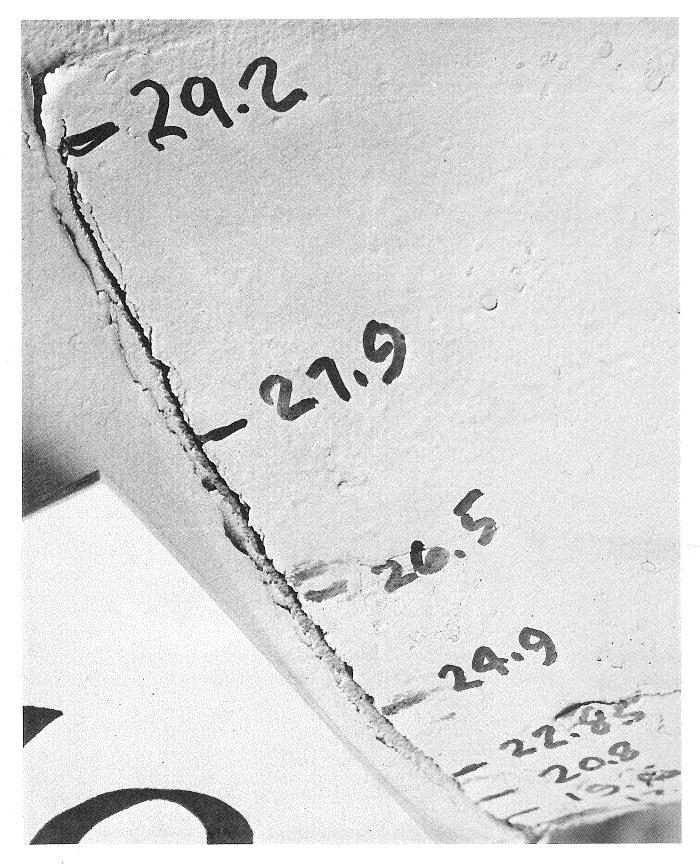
JOINT TYPE 3 - SPECIMEN No.6 (TAPERED GUSSET PLATE) DETAILED CRACK PROPAGATION IN DIAGONAL MEMBER
